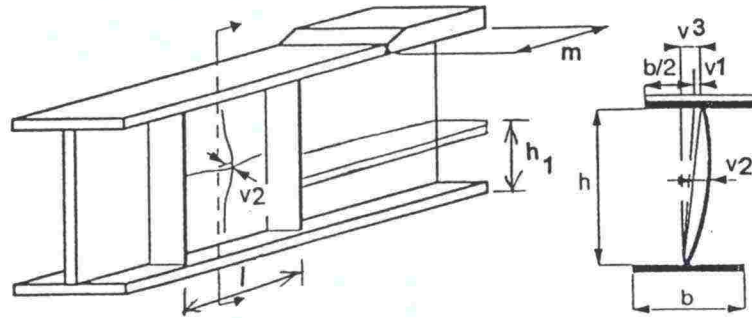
CROSS-SECTION DIMENSIONS OF GIRDER
